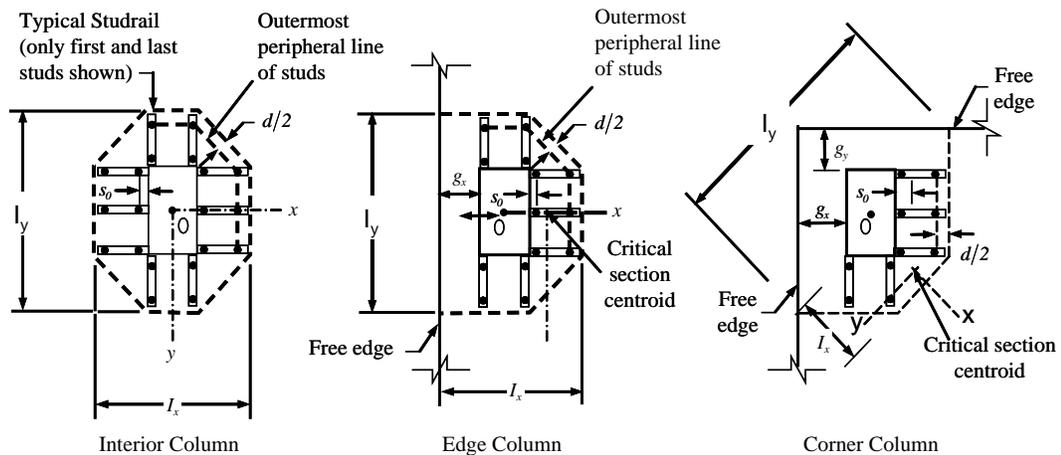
Typical arrangement of shear studs and critical sections outside the shear-reinforced zone
